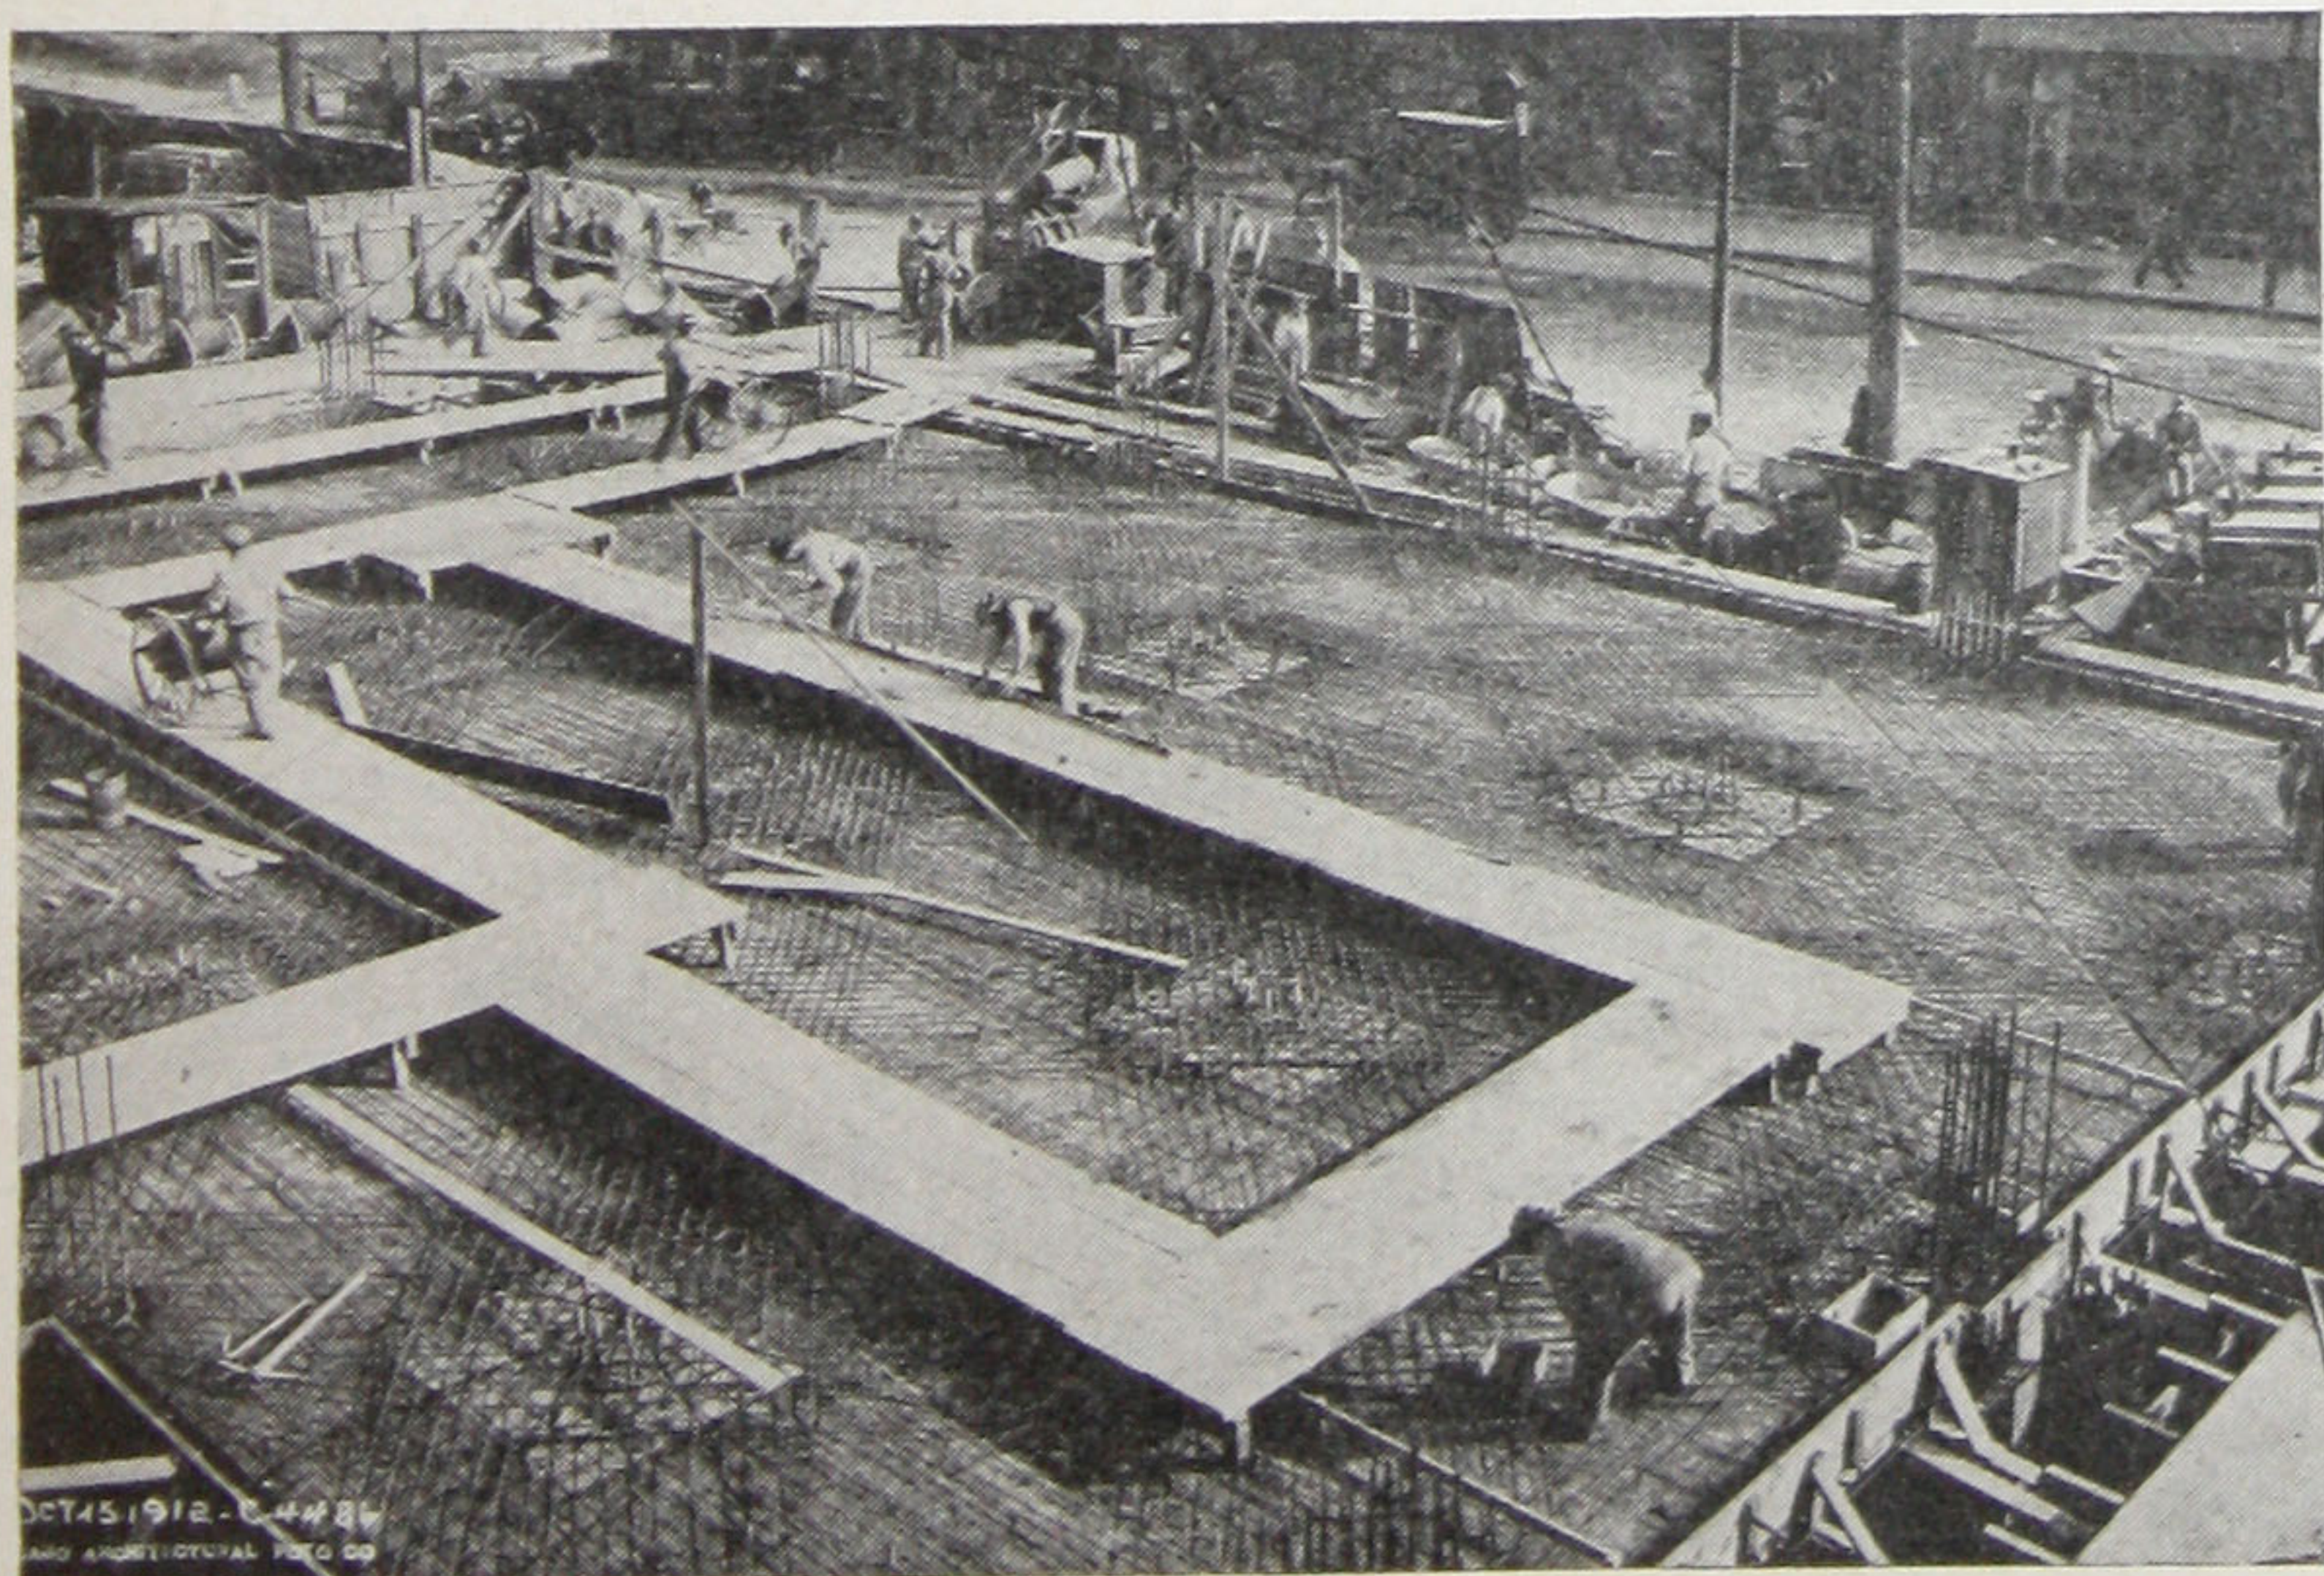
An example of flat slab floor construction. Notice reinforcing in place and runways for wheeling concrete buggies to allow for convenient depositing of concrete.
